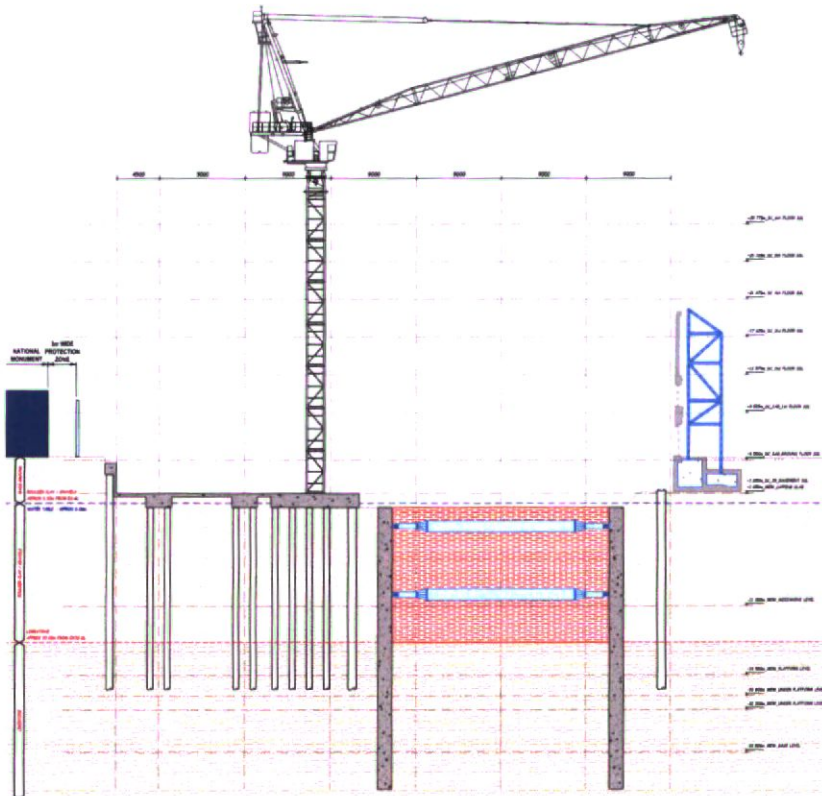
Phase 7 - Erect Tower cranes and commence excavation for MEW introducing back
